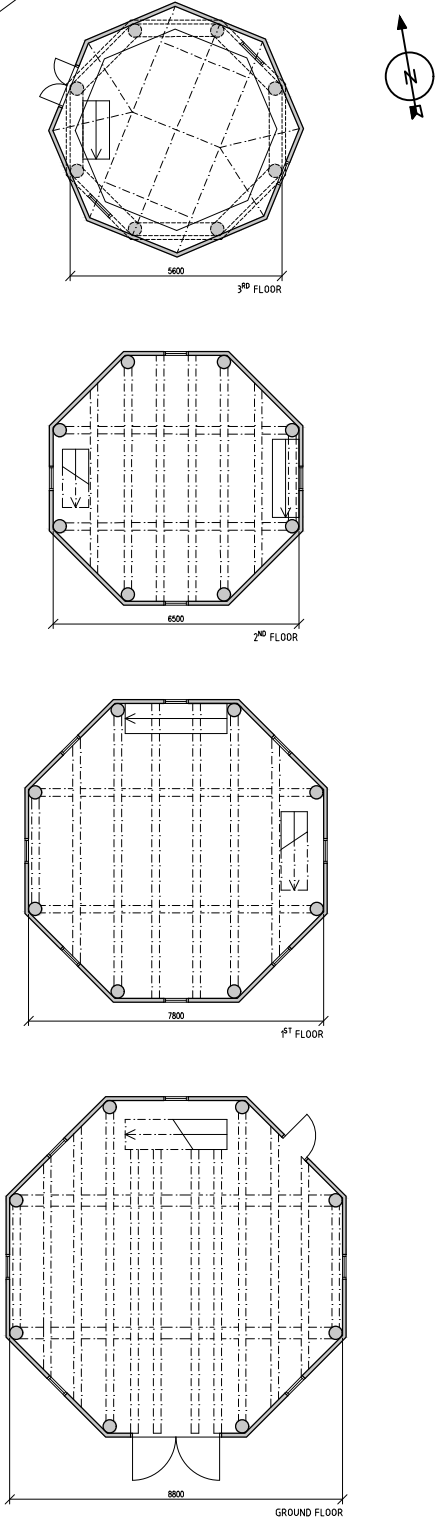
Existing floor plan of the Pilebo windmill, scale 1:200.
